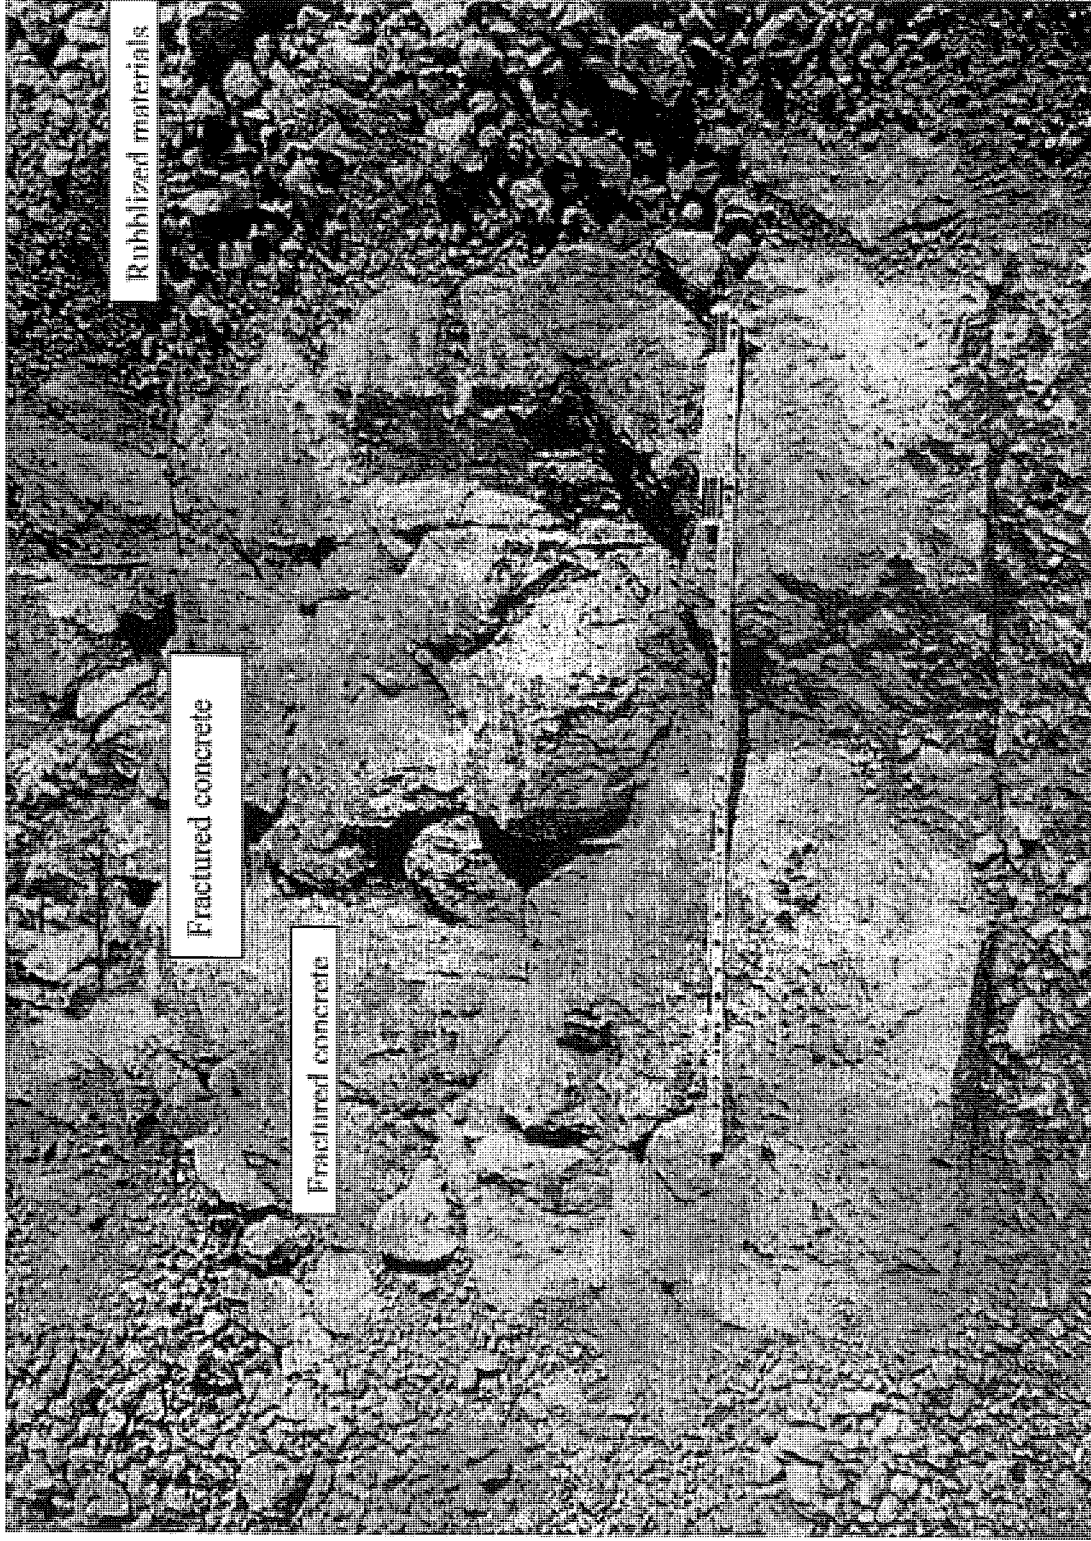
A typical trench in rubblized concrete pavement along US-10
